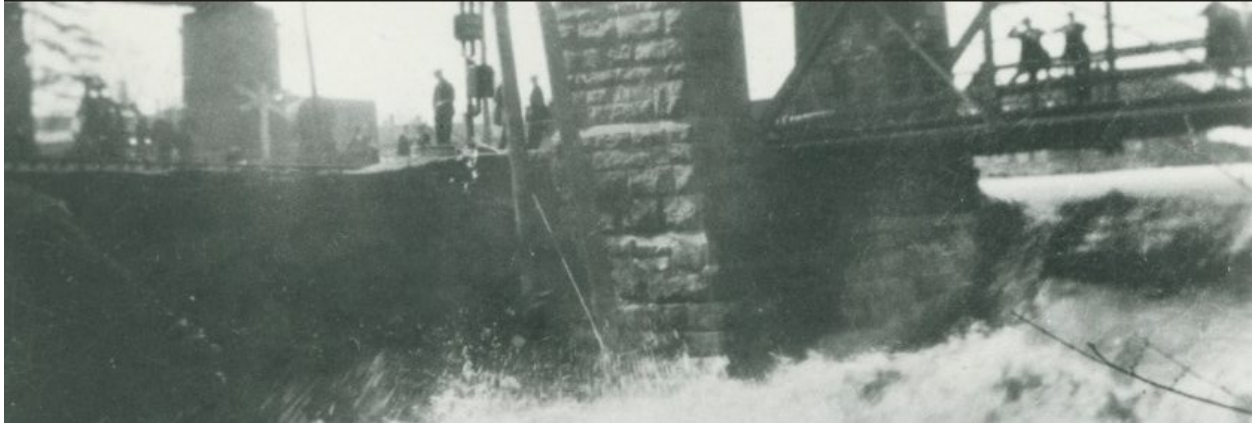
Detail of photograph of 1929 Flood under Allan's Bridge. Steel superstructure is still in place.
